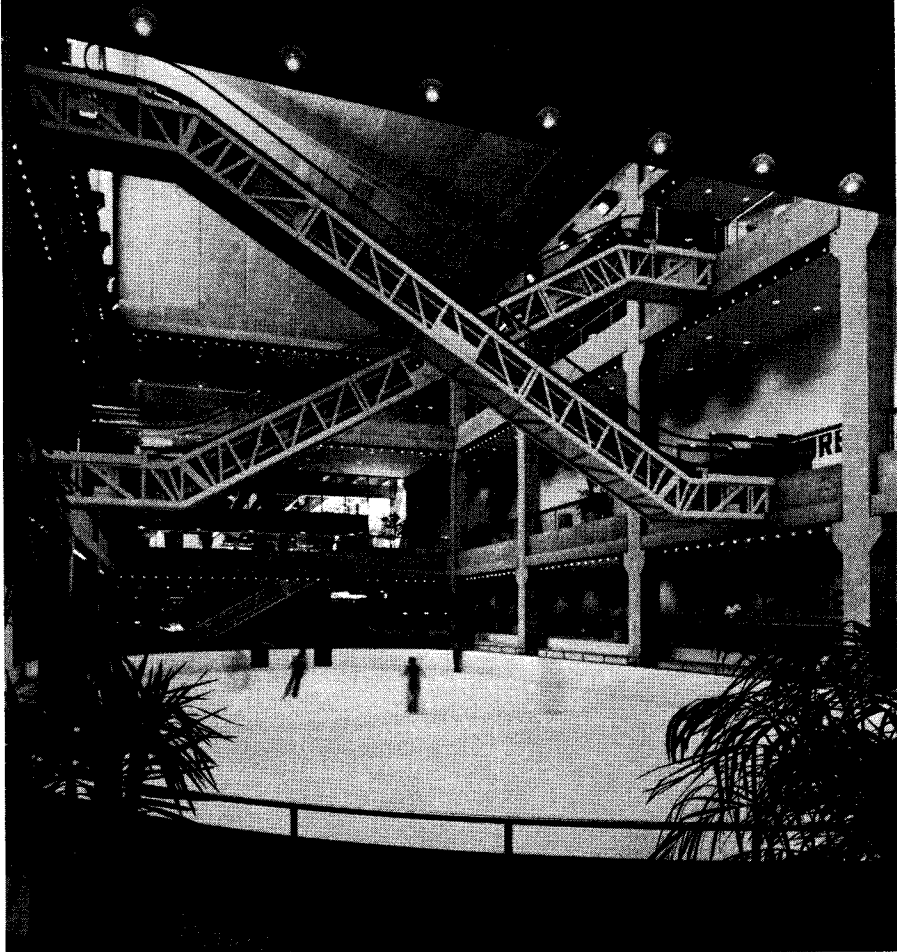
View of ice rink atrium; precast columns, beams, wall elements and spandek roof slabs are all architecturally expressed.
